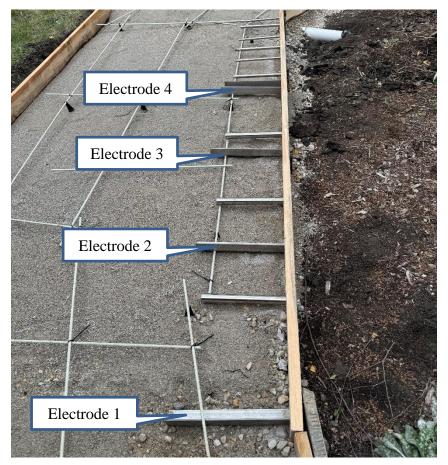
Electrode layout for the ECON demonstration sidewalk site
